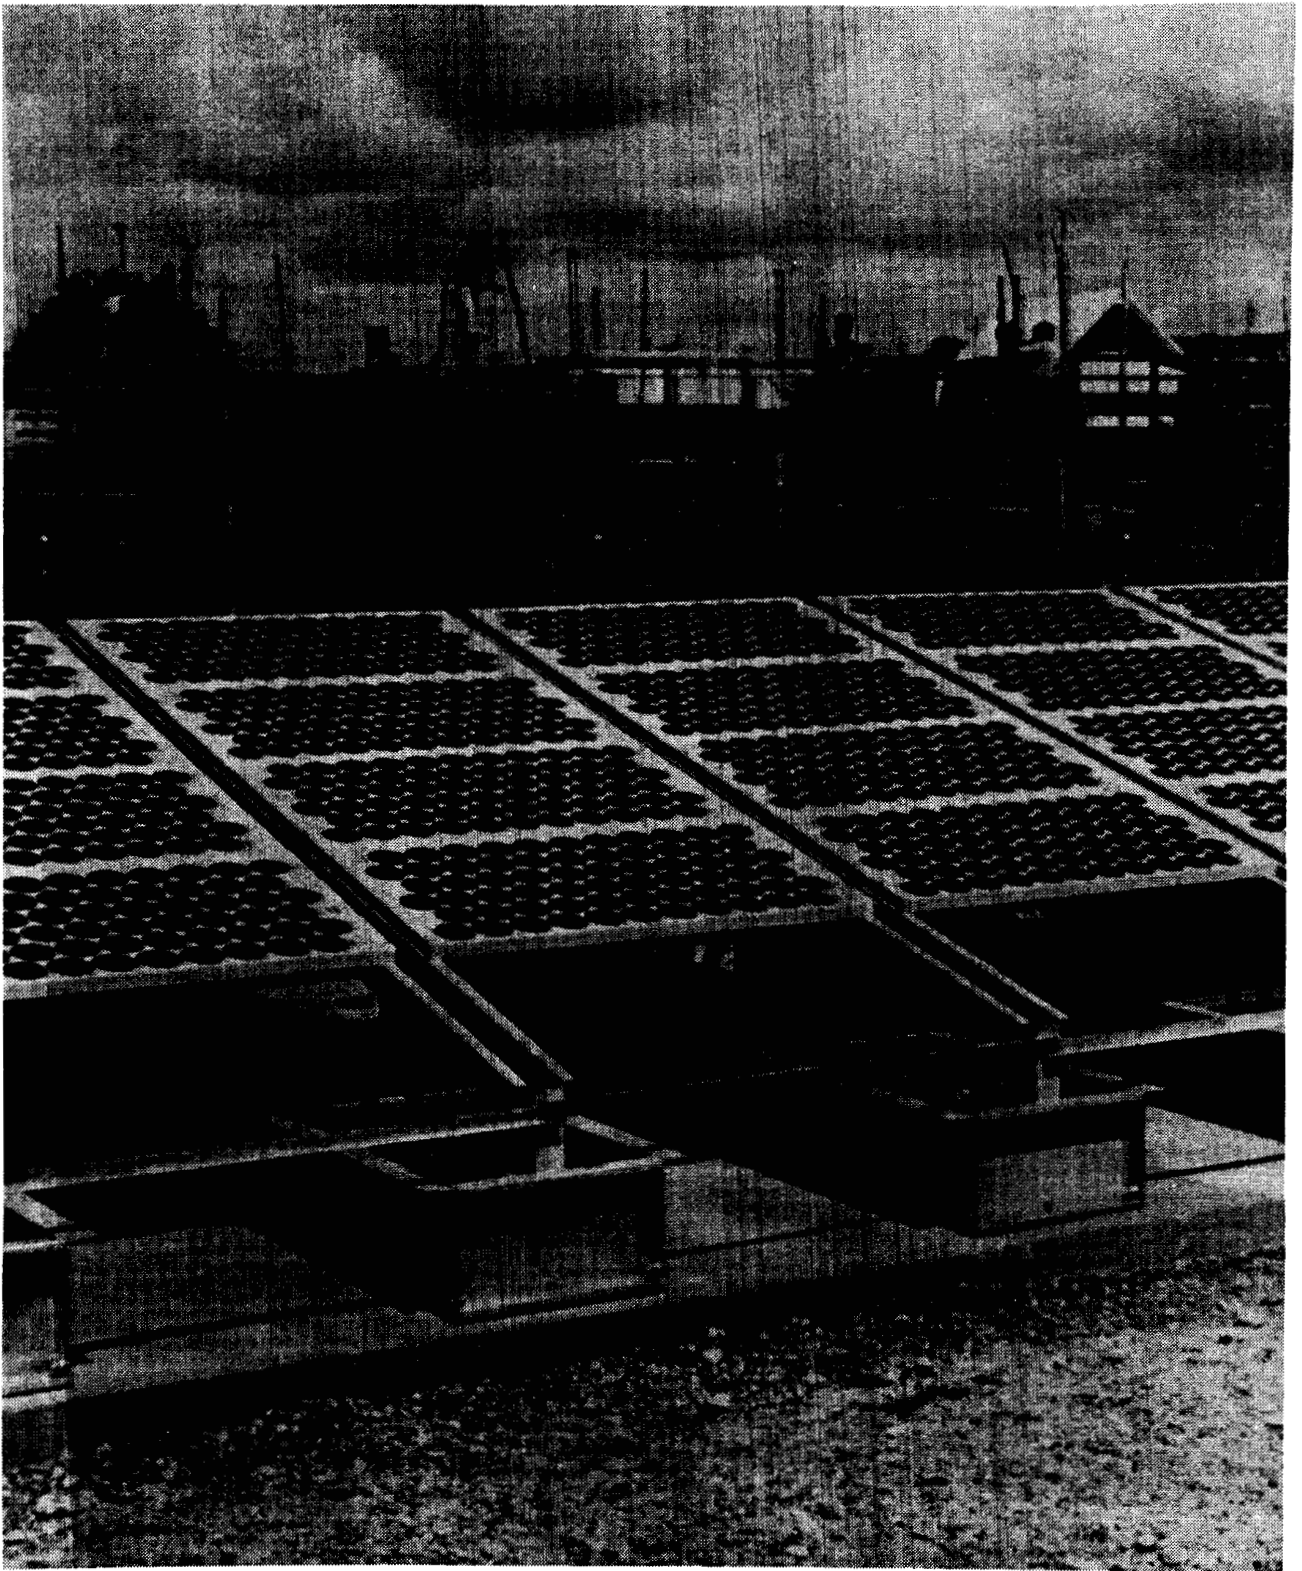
INSTALLATION OF BALLASTED PLANTERS ON PAD
